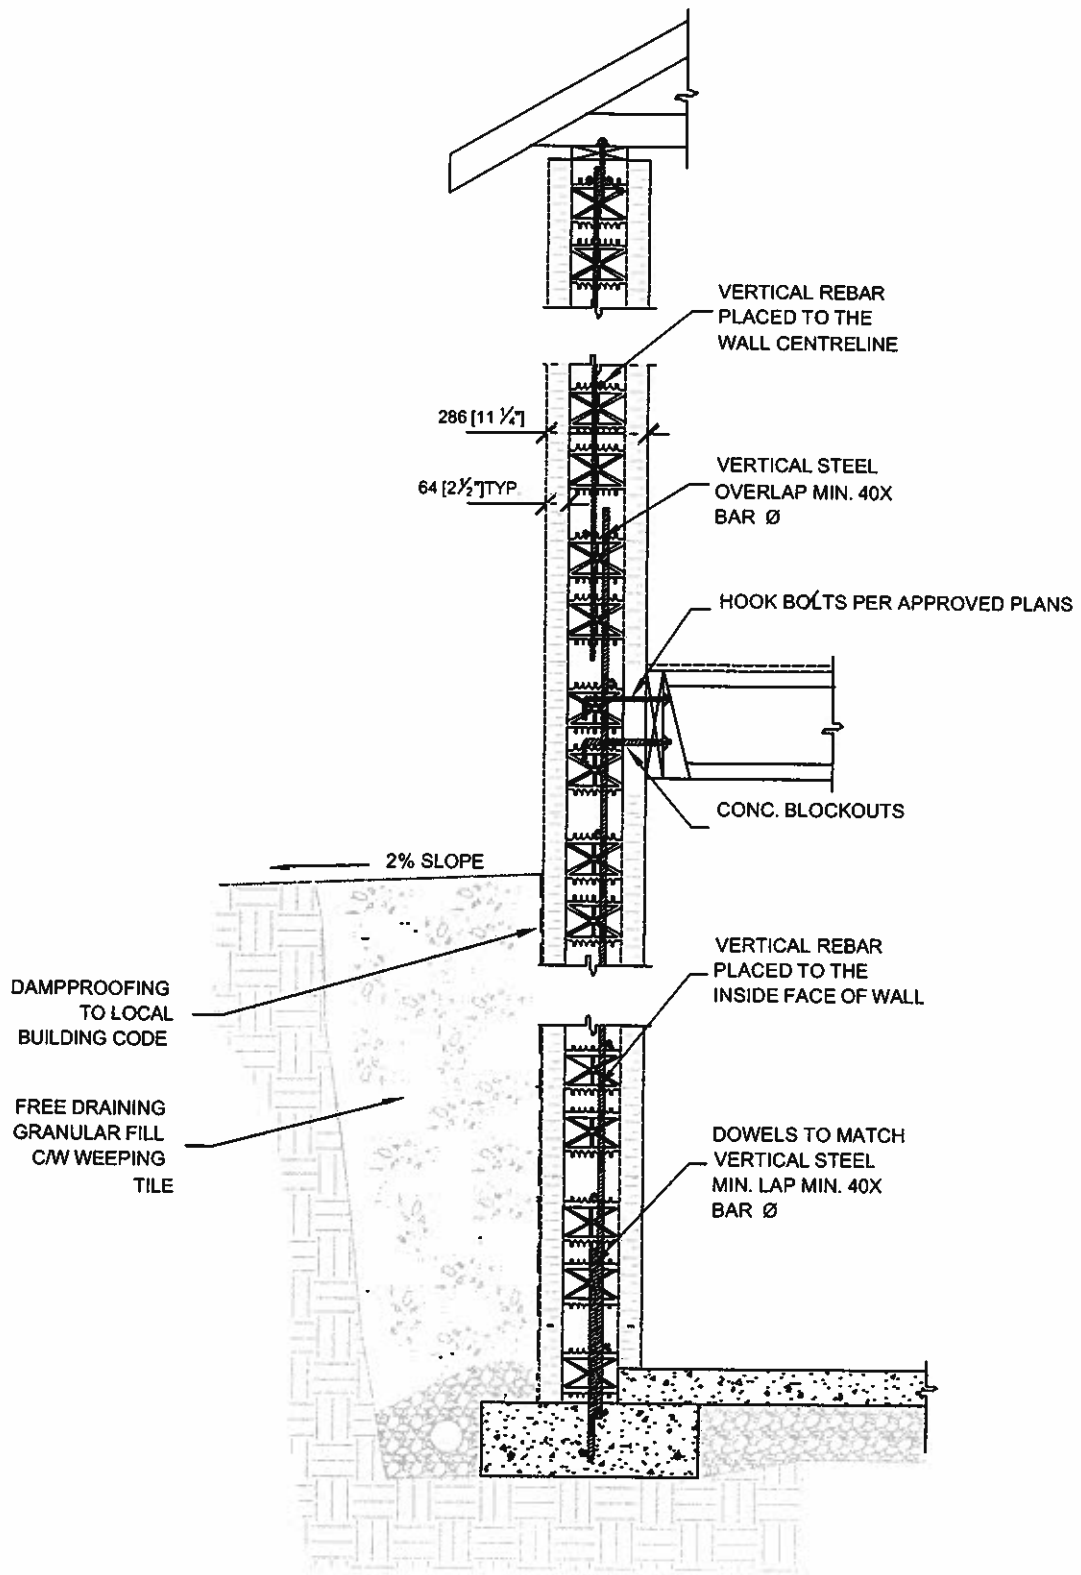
TYPICAL WALL SECTION, ADVANTAGE ICF SYSTEM, FOUNDATION AND ABOVE GRADE
